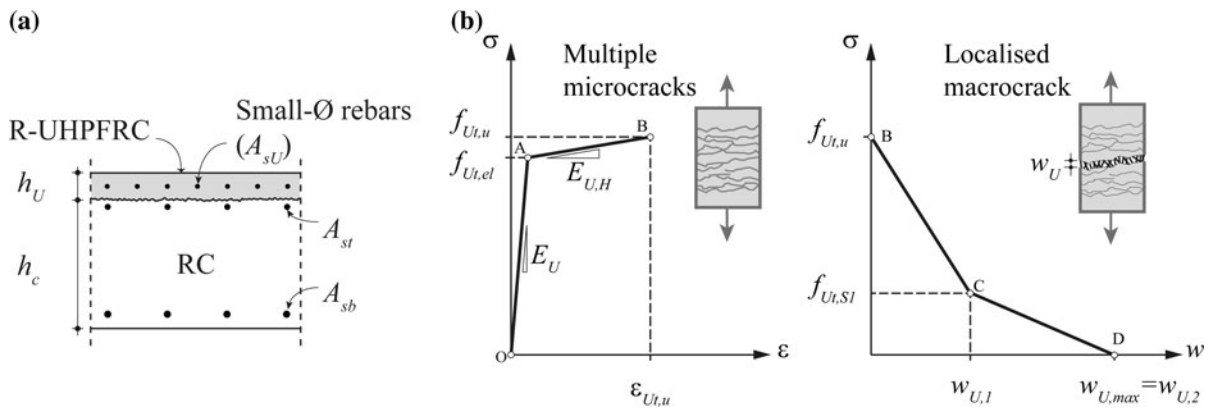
a Cross section of an RU-RC slab strip; b Constitutive laws of UHPFRC [17]
